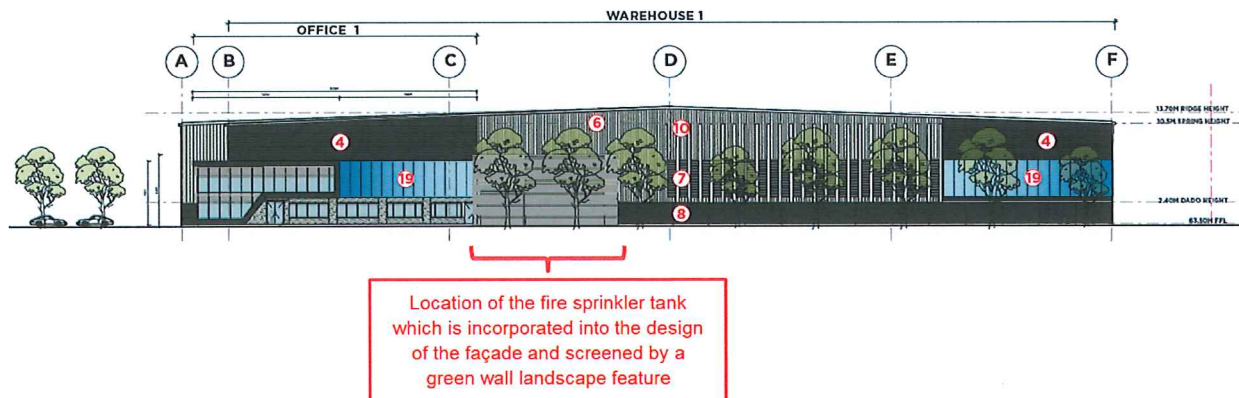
Marked up extract of the South Elevation Plan identifying the location of the encroachments into the 10 m street setback, which are incorporated into the design of the façade and are screened by landscaping
